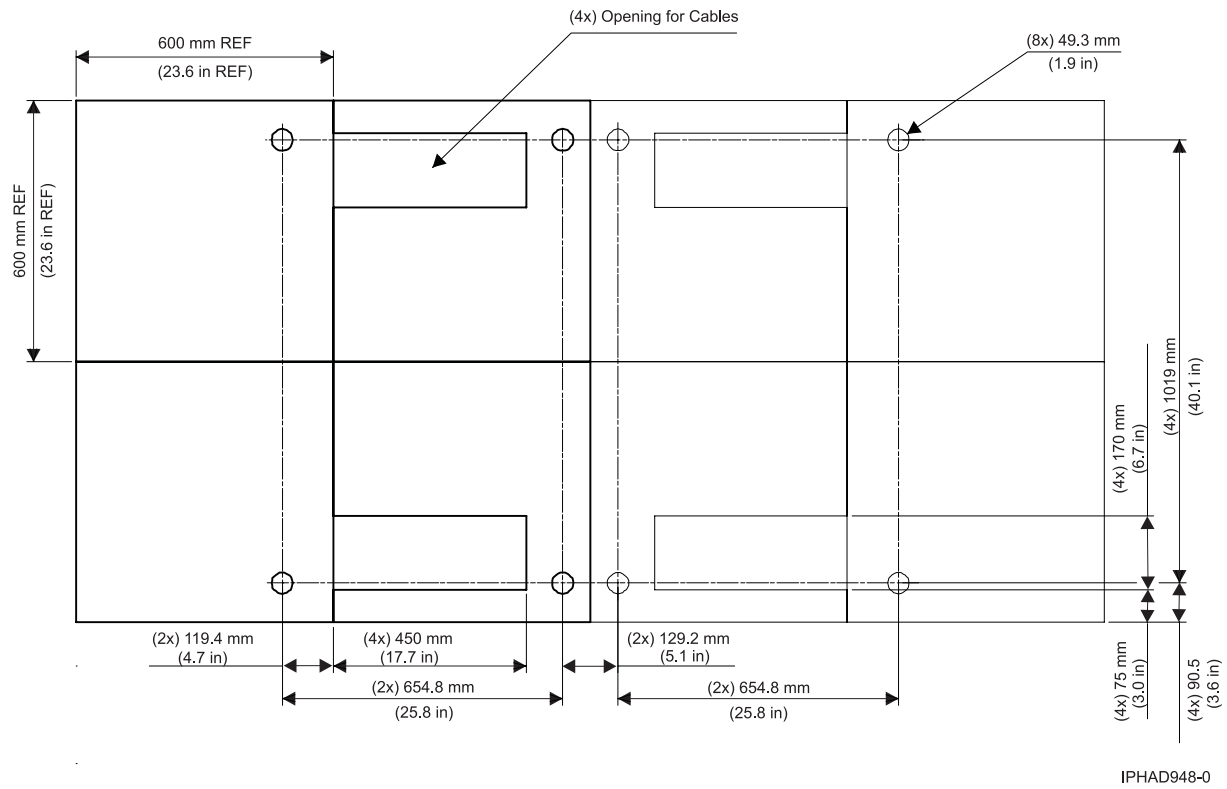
Eyebolt positioning for 600 mm (23.6 in.) floor tile layout
